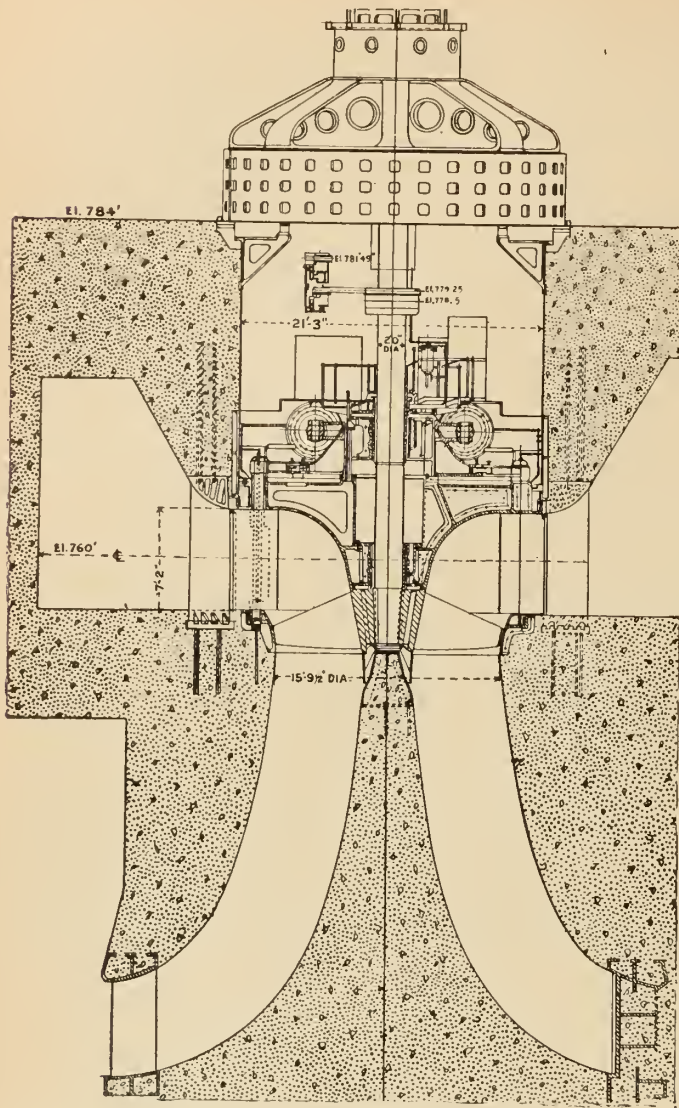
Cross-section of Diagonal Type Runner Installation.
